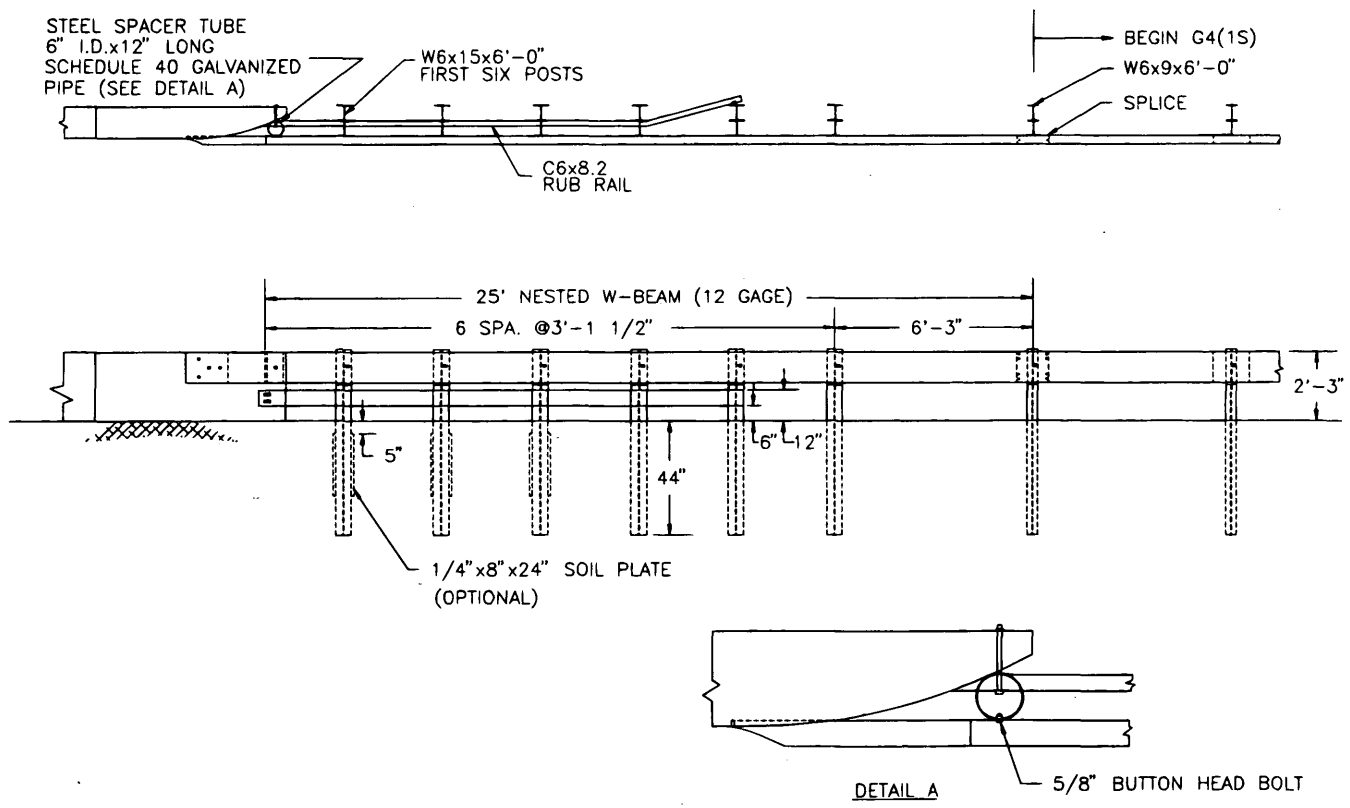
Modified steel post transition to vertical concrete parapet—rub rail option.
